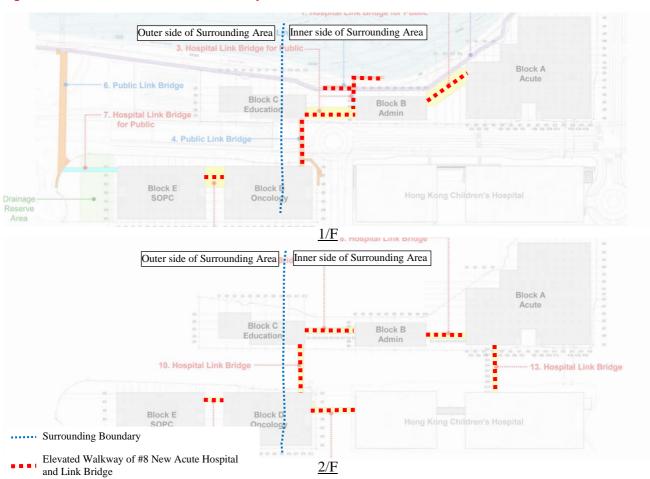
Elevated Structure of #8 New Acute Hospital and Link Bridge
